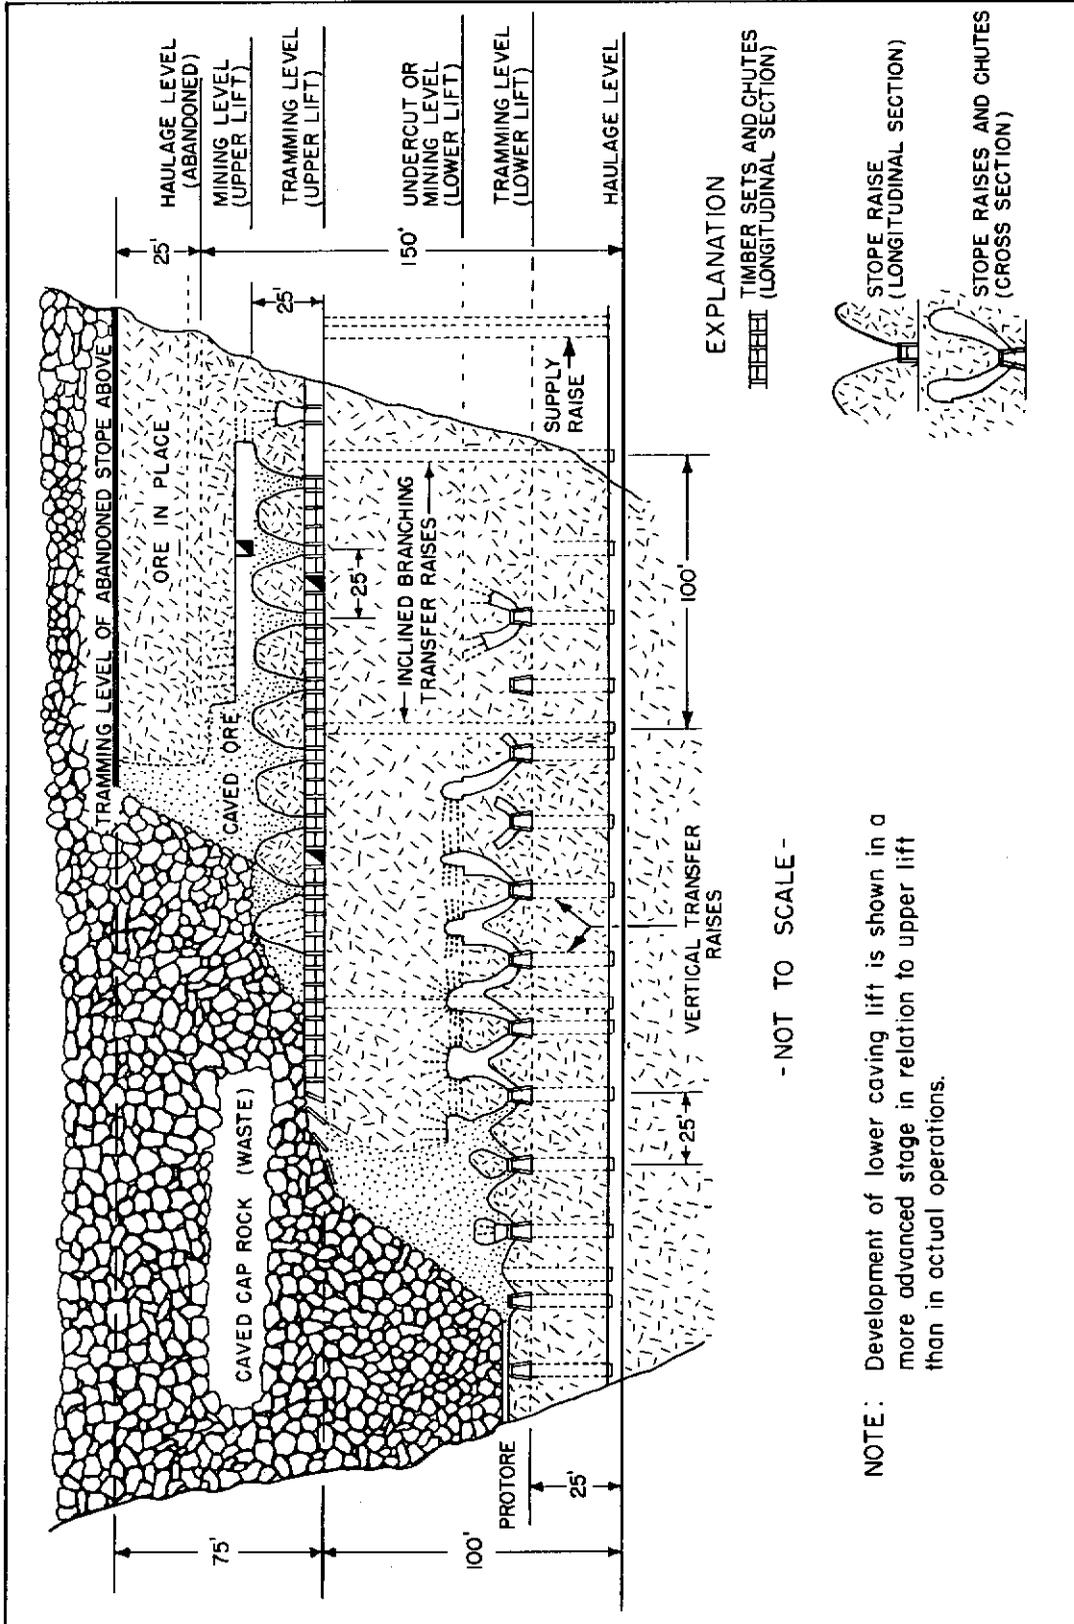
Longitudinal Section of Panel-Caving Stope.
